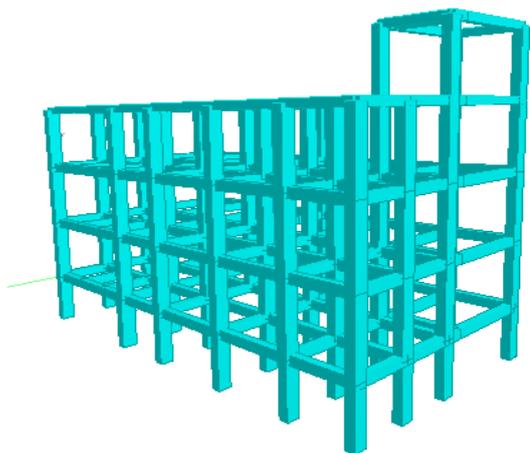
3-D view in STAAD.Pro without floating column
